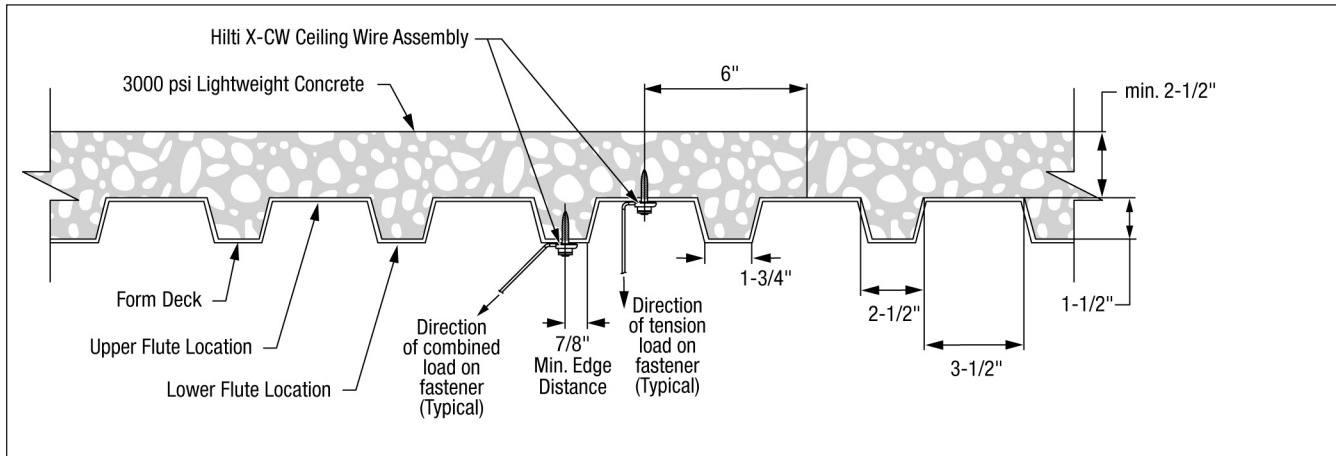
Hilti X-CW Ceiling Wire Assembly Location in 1-1/2-in.-Deep Composite Floor Deck, Normal Deck Profile Orientation
